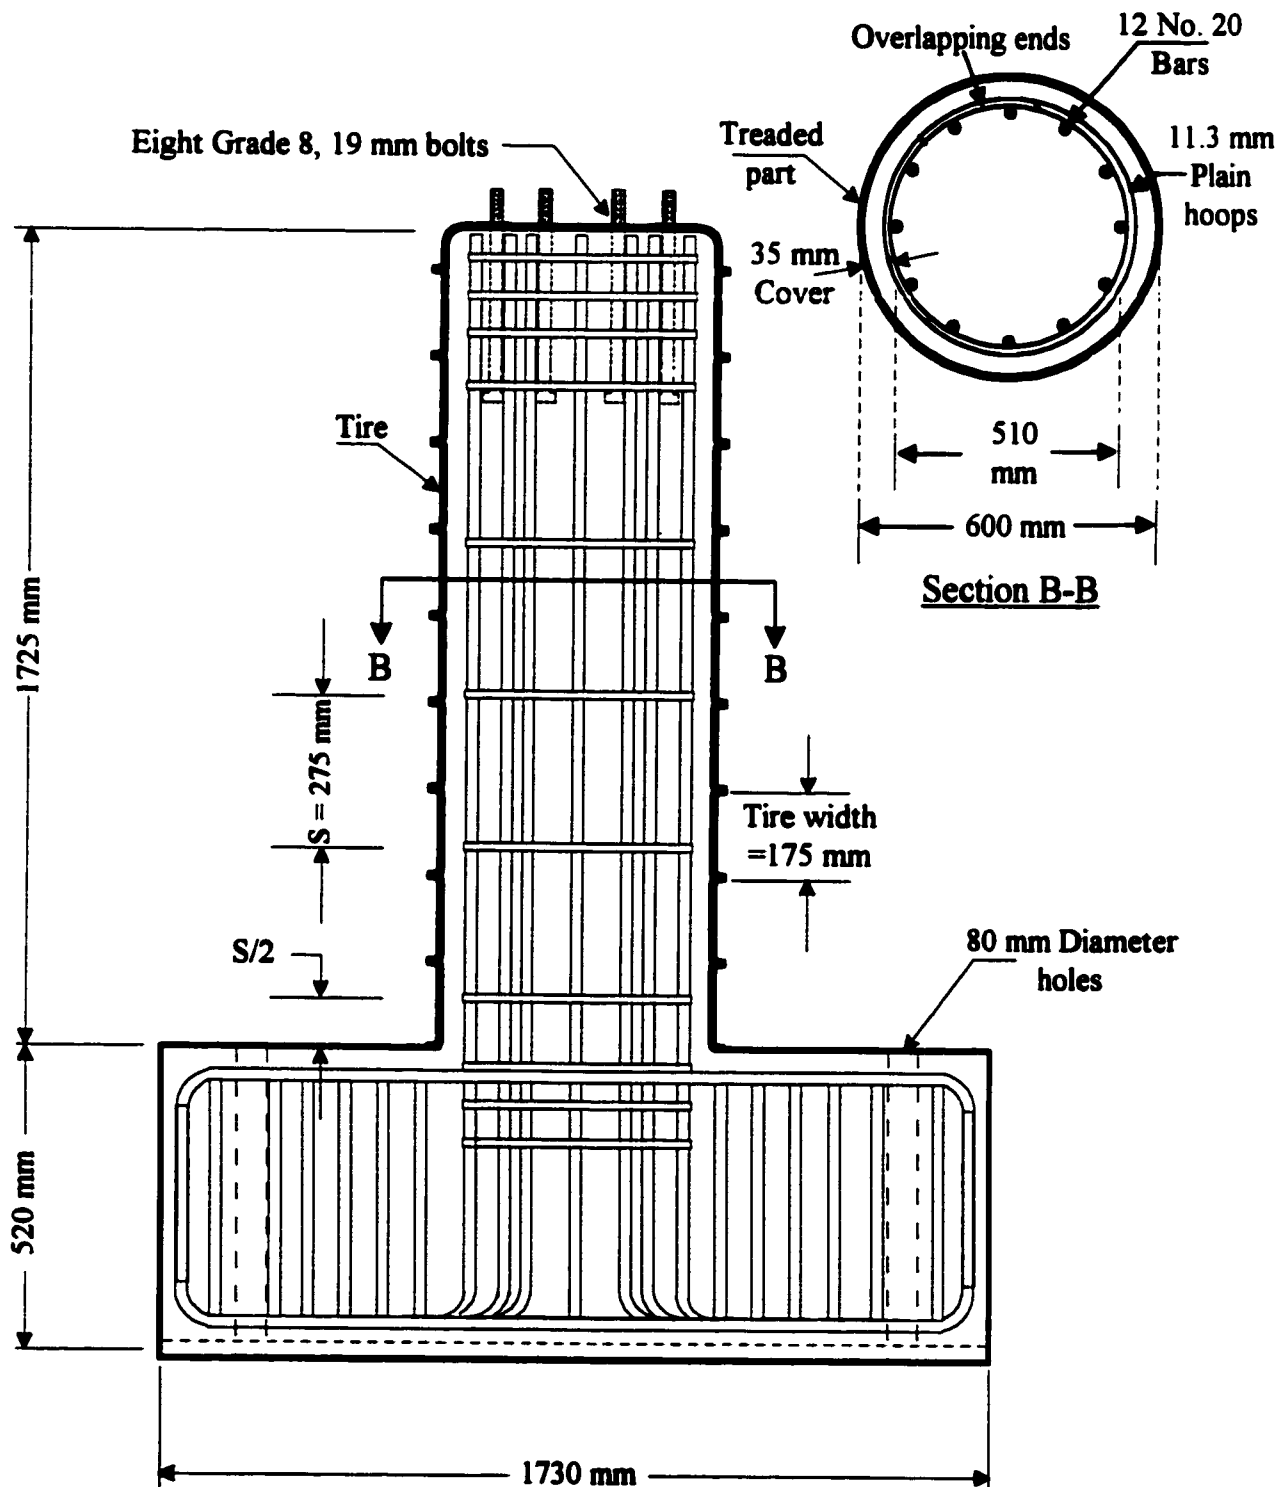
Reinforcement Details for Columns TC-3 and TC-4
